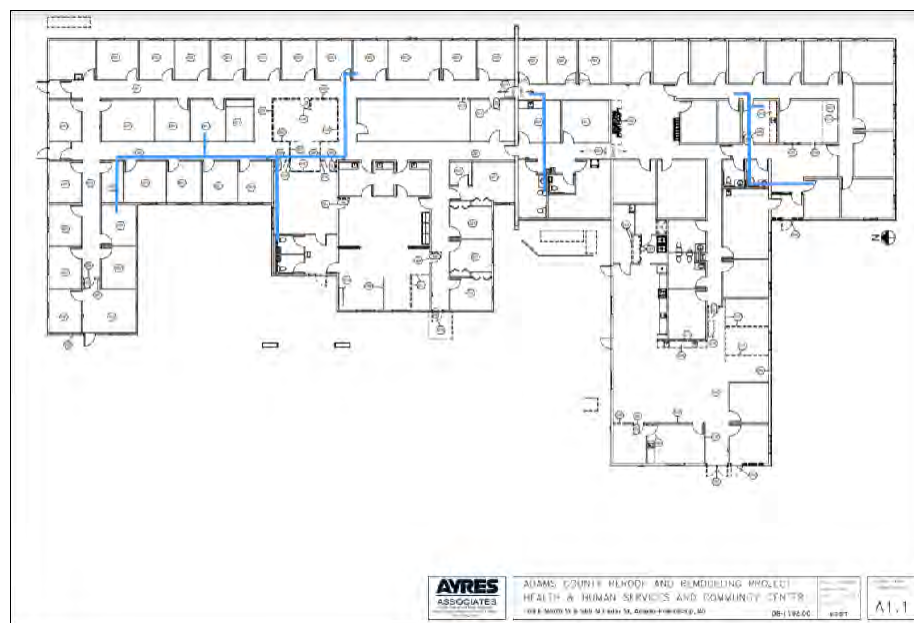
Proposed Plumbing Line Additions for Alternative 3
